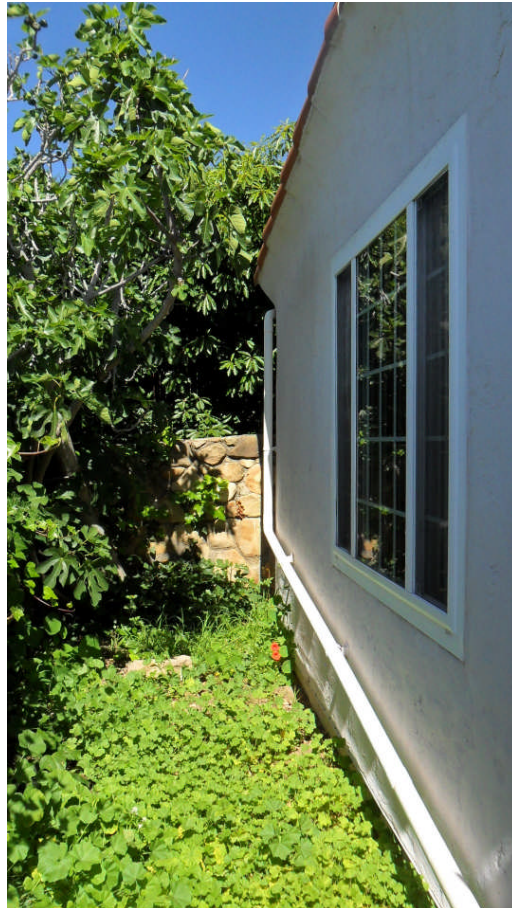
, Detail of First Floor Window at North End of West Elevation, looking north
